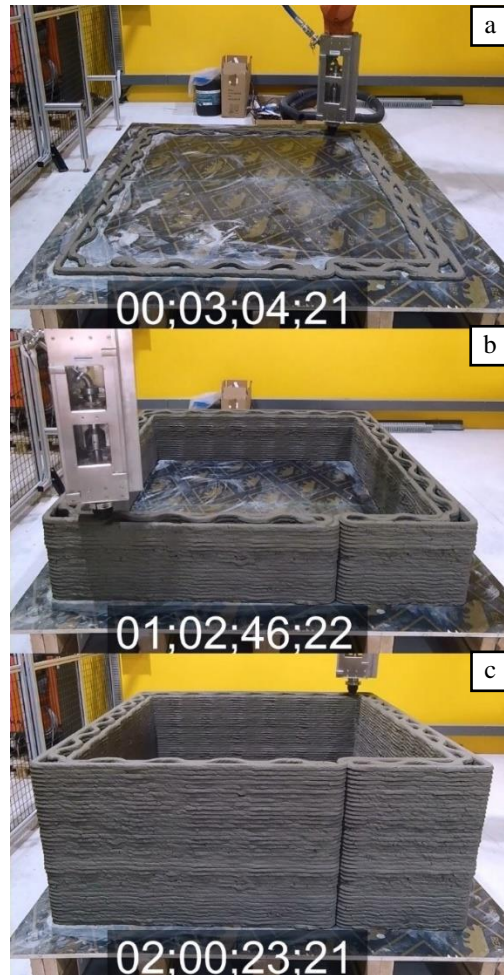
Printing process of the 600 mm part. (a) printing the 1<sup>st</sup> layer
